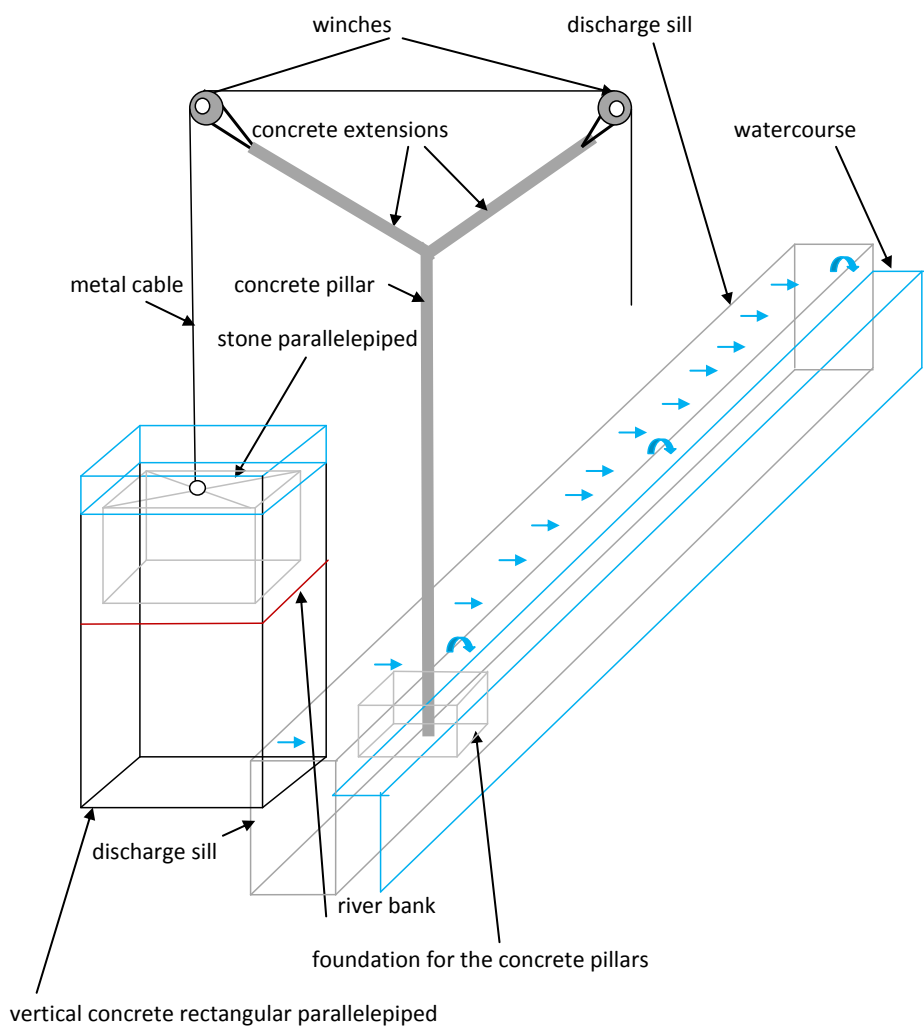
Positioning the foundation for the concrete pillars - indicative scheme
